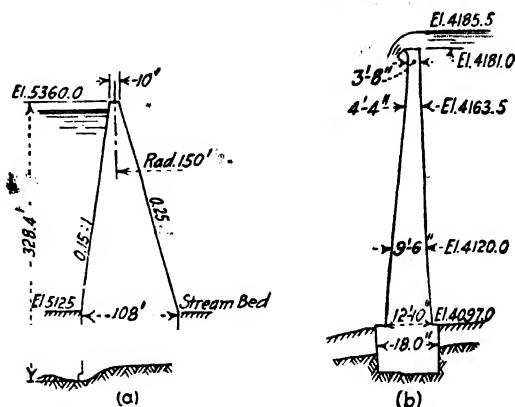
Sections of arch dams (a) Shoshone, (b) Huacul.
